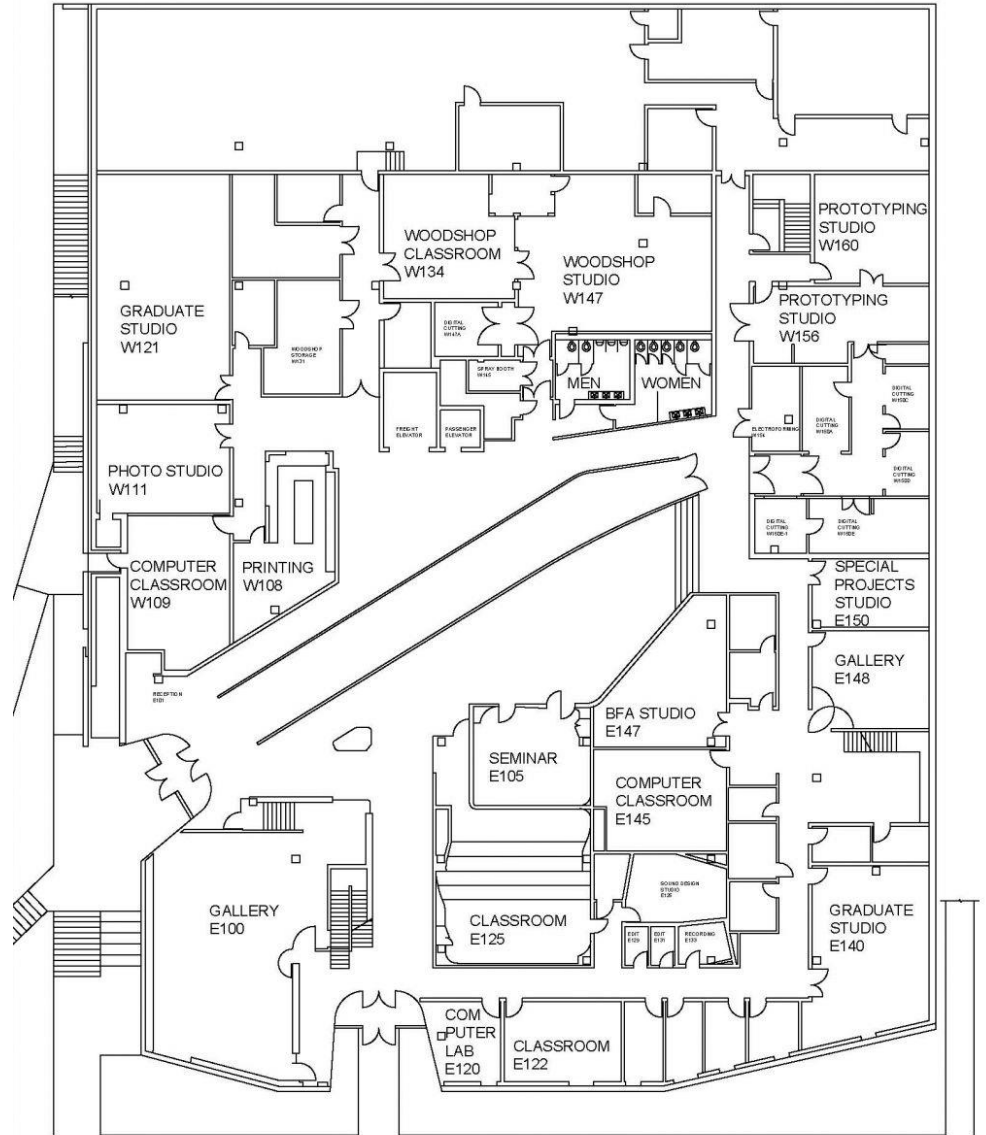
FIRST FLOOR PLAN (CASE STUDY02)
